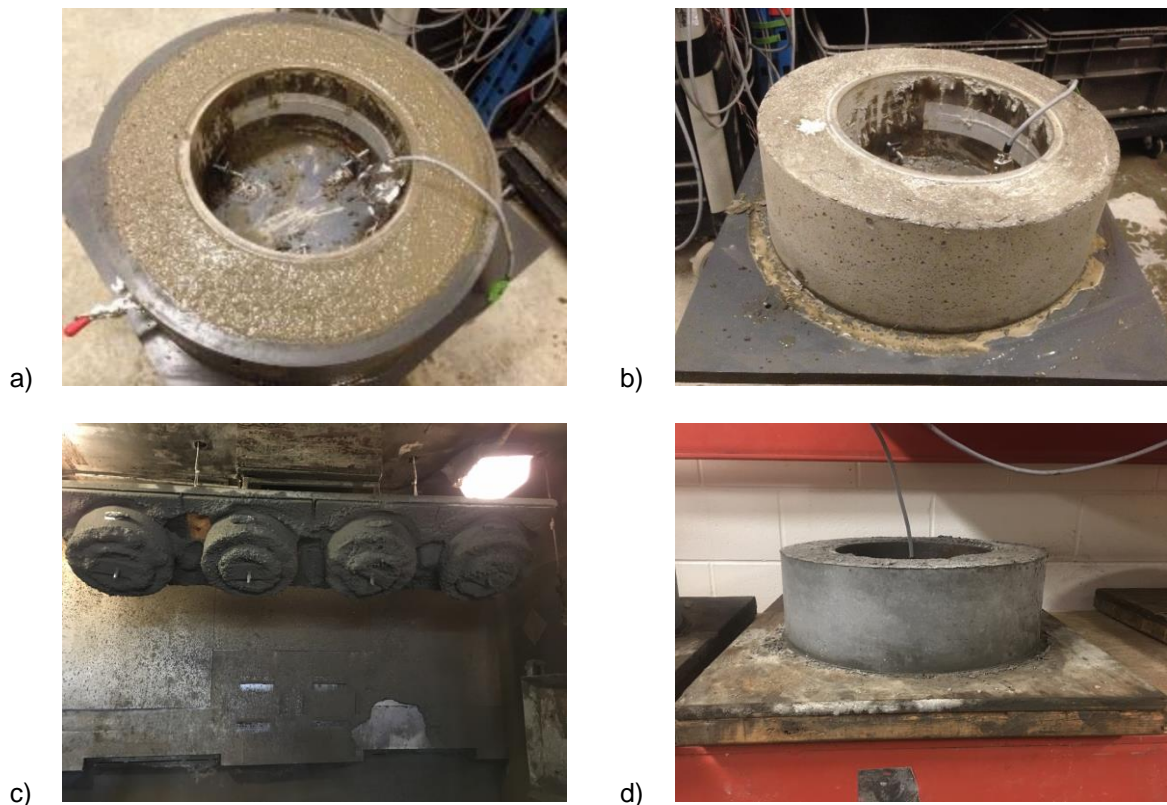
AASHTO T334-08 ring test specimens: a) cast ring specimen with outer PVC wall (before demolding); b) demolded cast ring specimen at 24 h; c) inclined overhead sprayed ring specimen with outer steel wall (before demolding); and d) sprayed demolded ring specimen at 24 h
